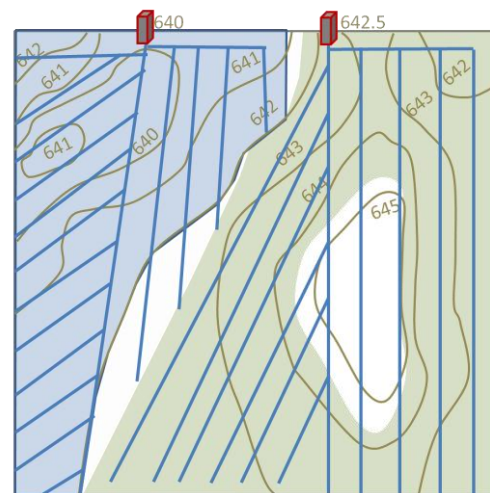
A DWM design shows the topography, drainage system, and impacted area
